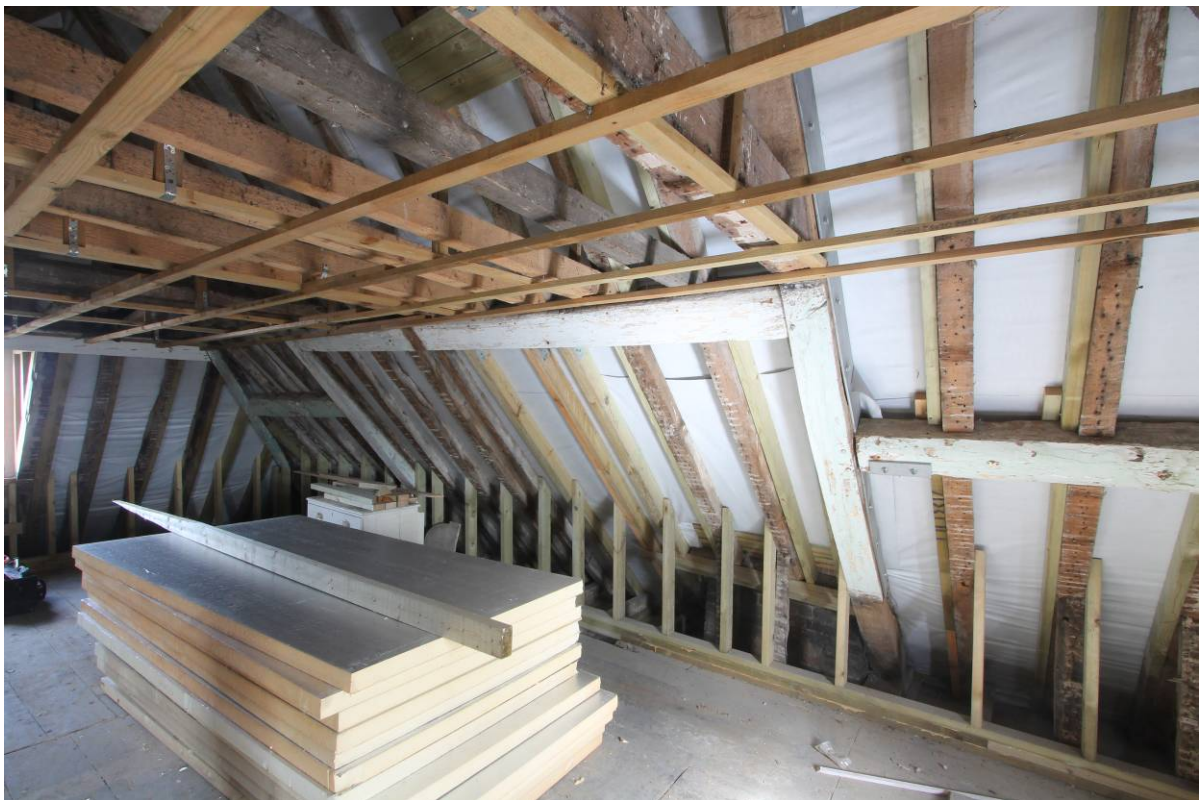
Attic floor showing joggled butt purlins, looking north-east
